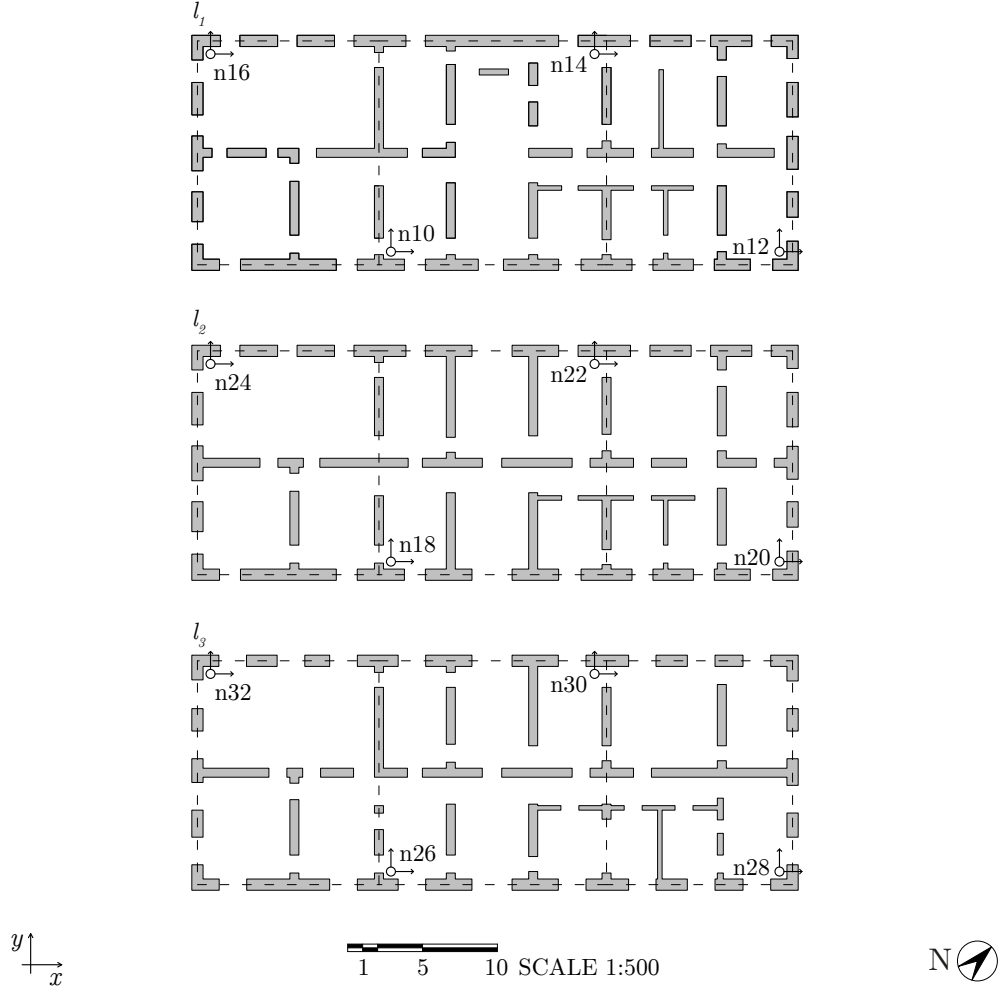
Structural plans of the Alassio town hall building, highlighting the position and orientation of the sensors.
